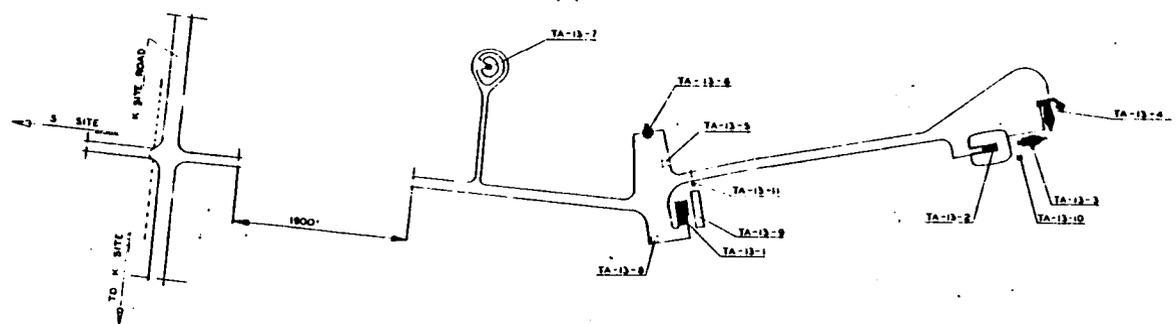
Structure Location Plan for TA-13 - P Site
